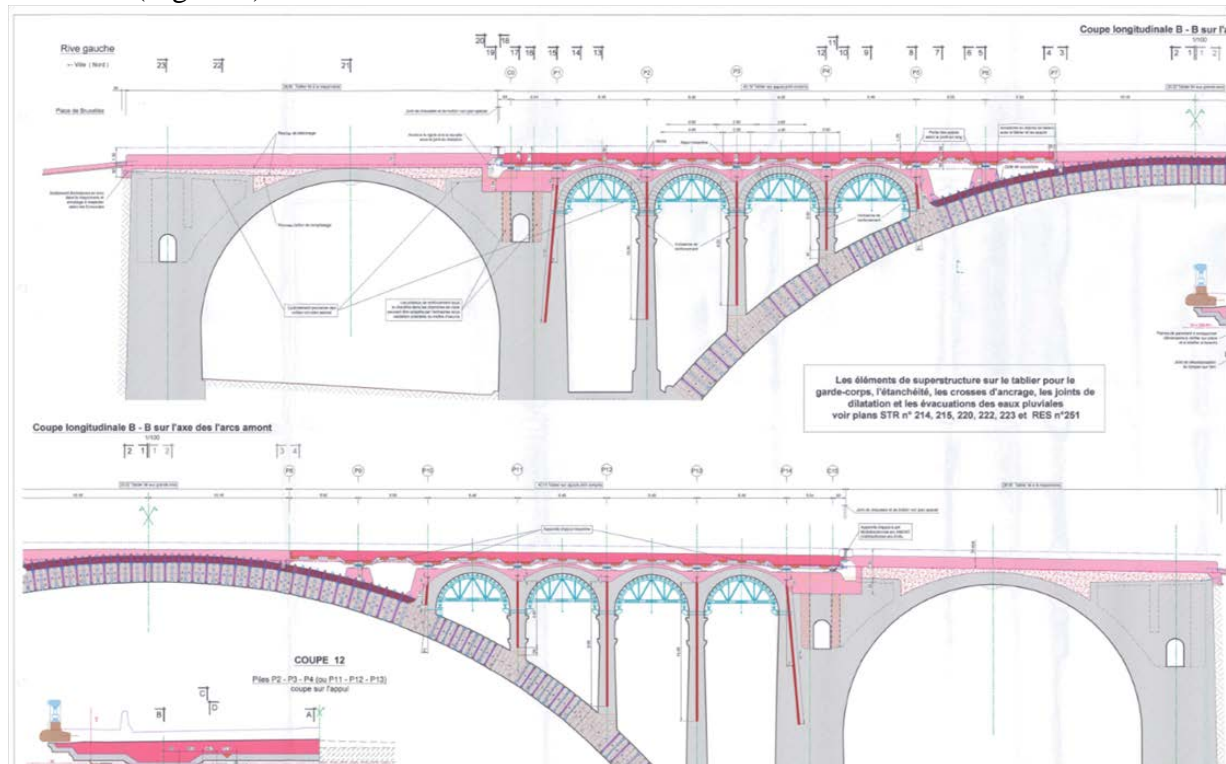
Structural strengthening of the piers using ø40 mm rebar.
